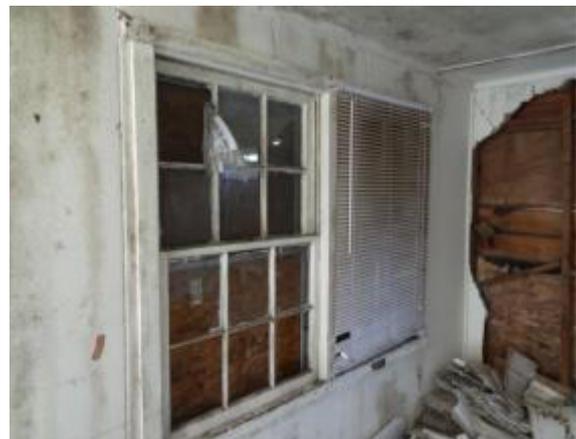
Photograph of one of the remaining windows and trash covered floor (March 13th, 2014)
